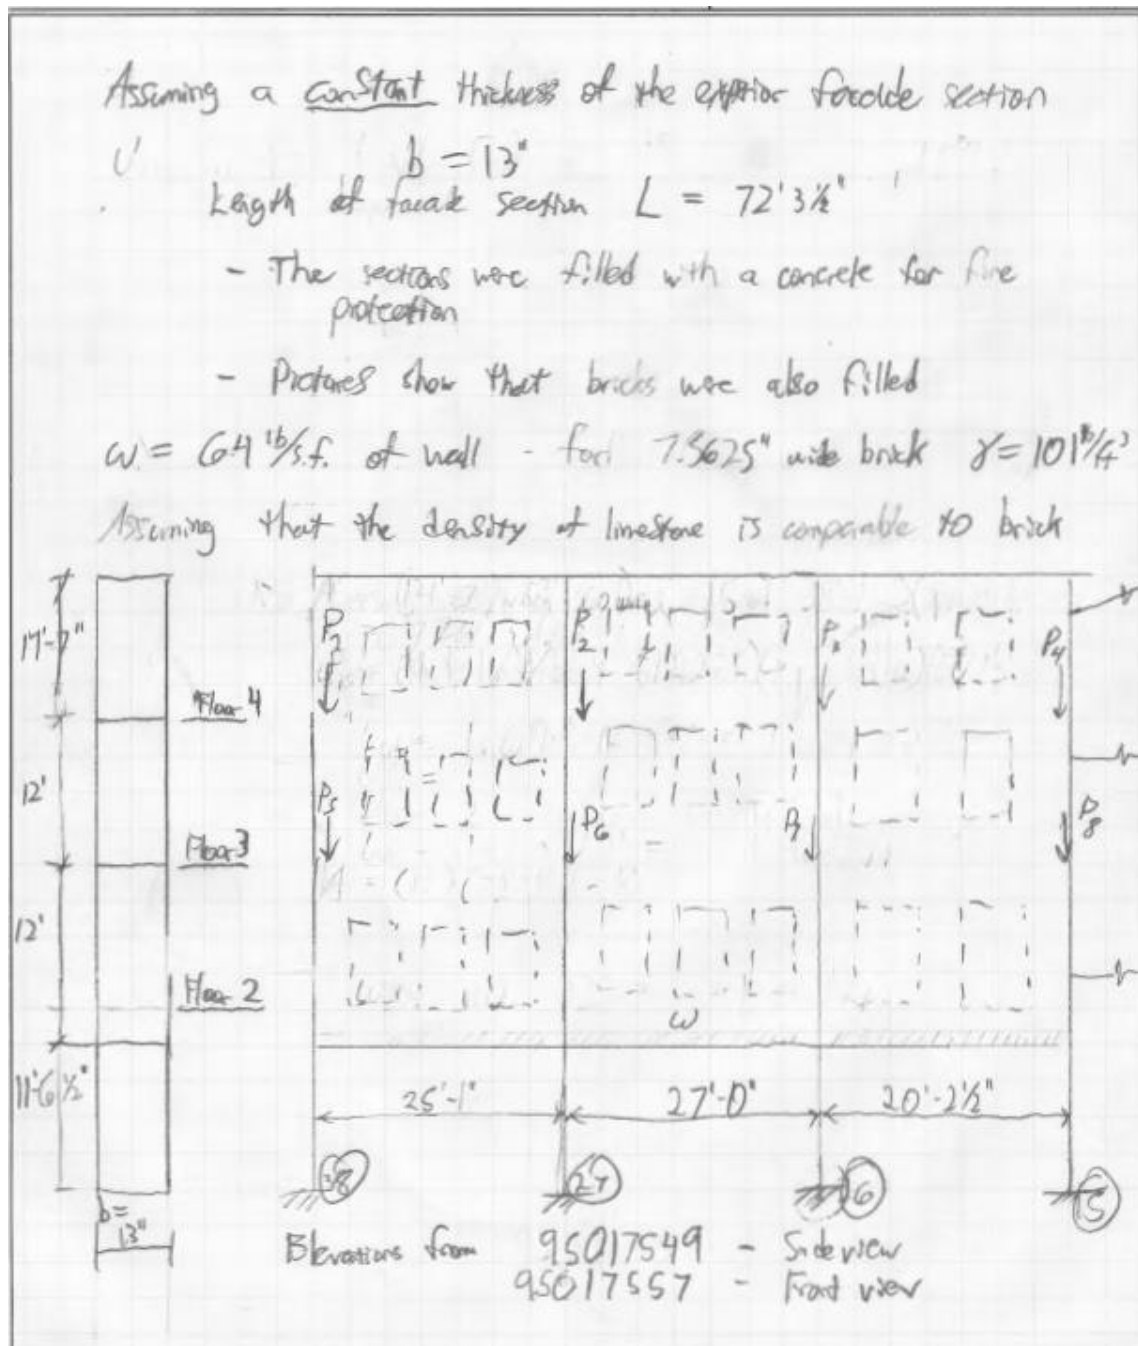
Calculations for roof and wall loads – wall density and façade area
